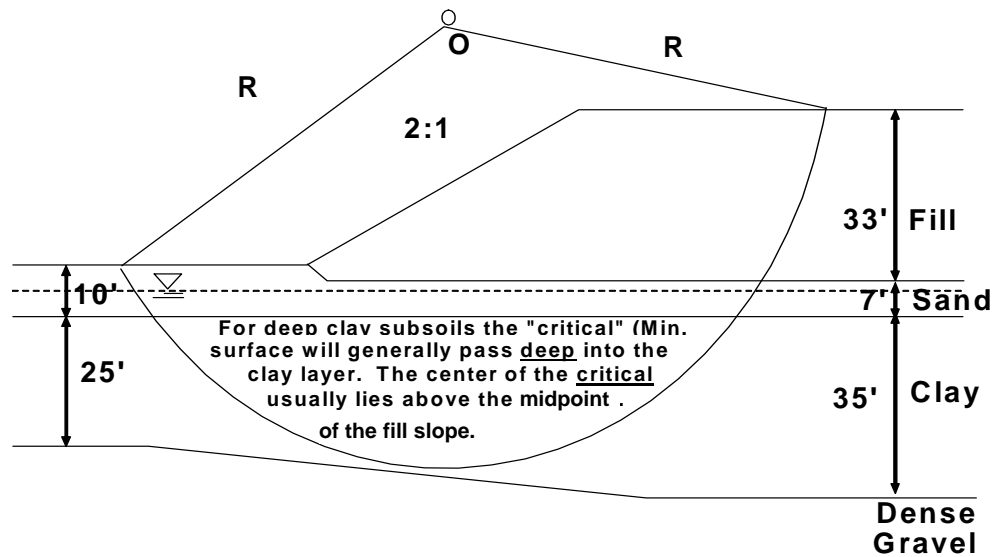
Trial failure circle – Embankment fill - East Abutment.
